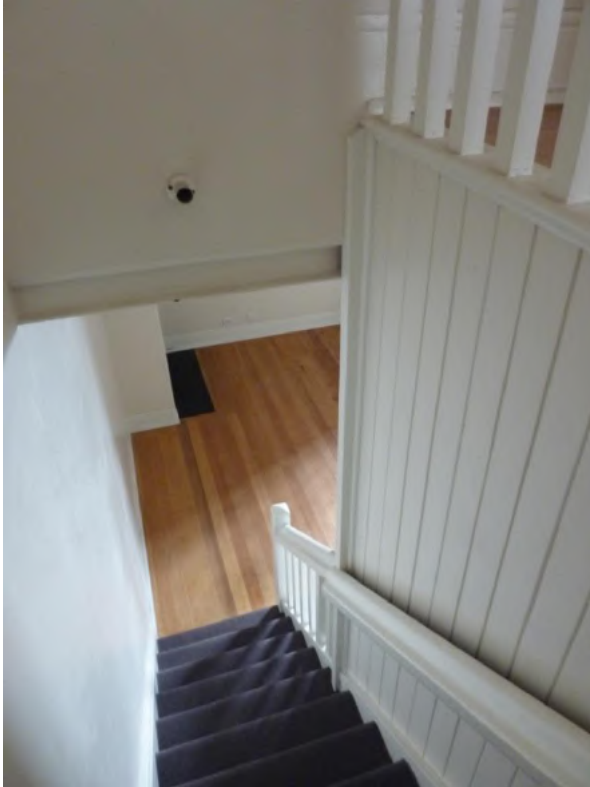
The stair (space G.7) showing original timber handrail and modern T&G boarding—48 / 46–56 Gloucester Street. (Source: GML heritage, May 2016)
